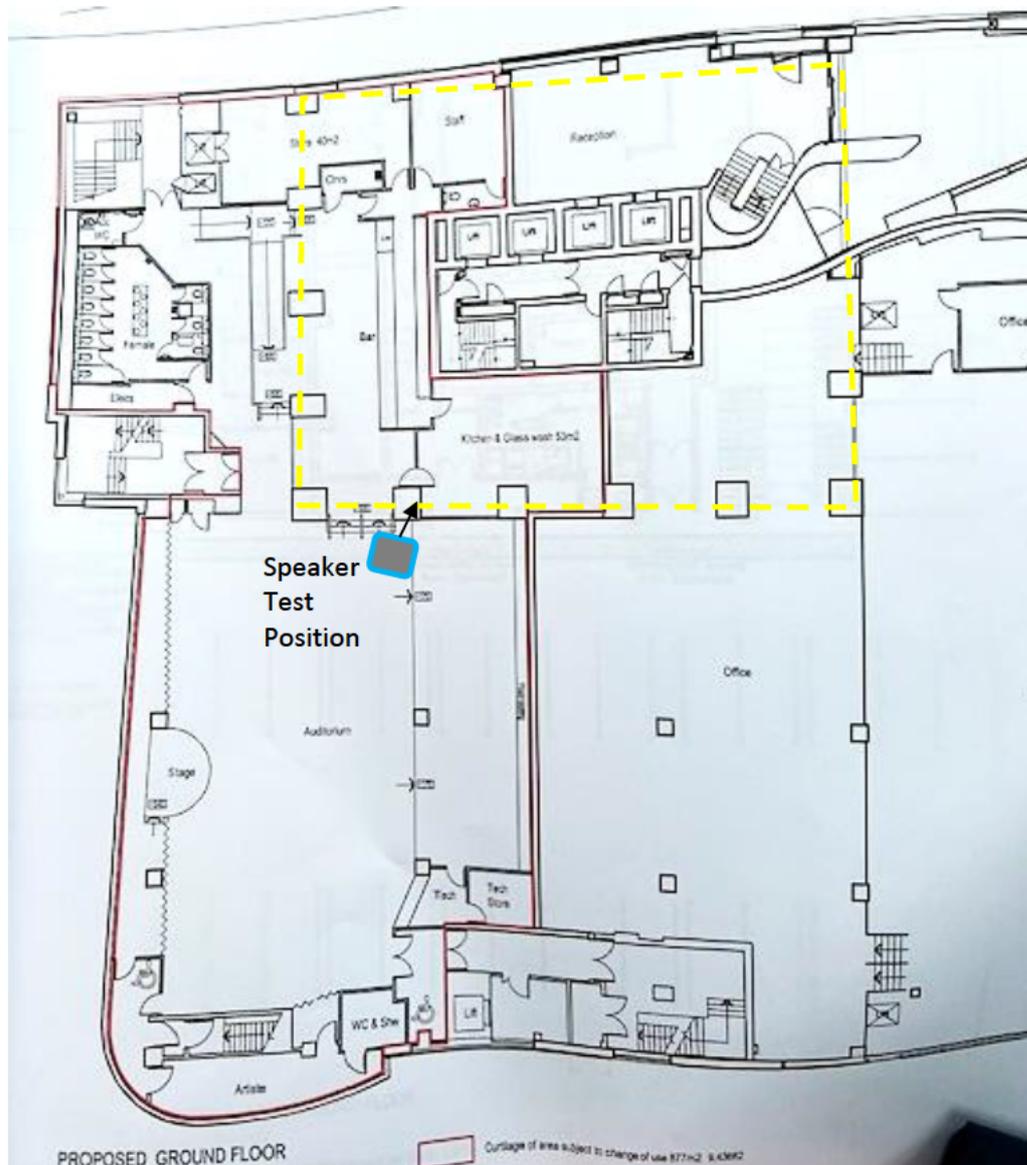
Proposed site layout plan (footprint of residential block 125 in yellow) and unit within red line
